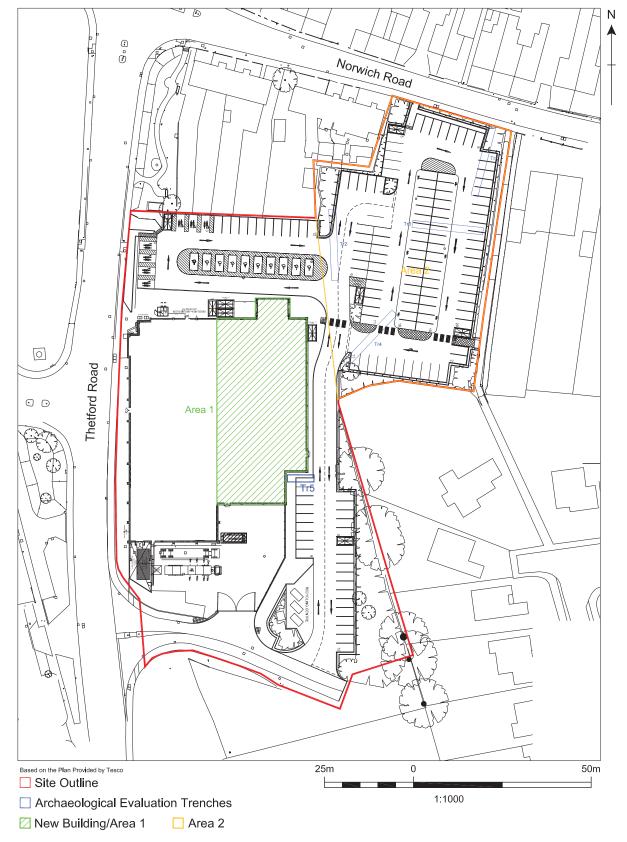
Detailed Site Location Plan Based on the Proposed Development
